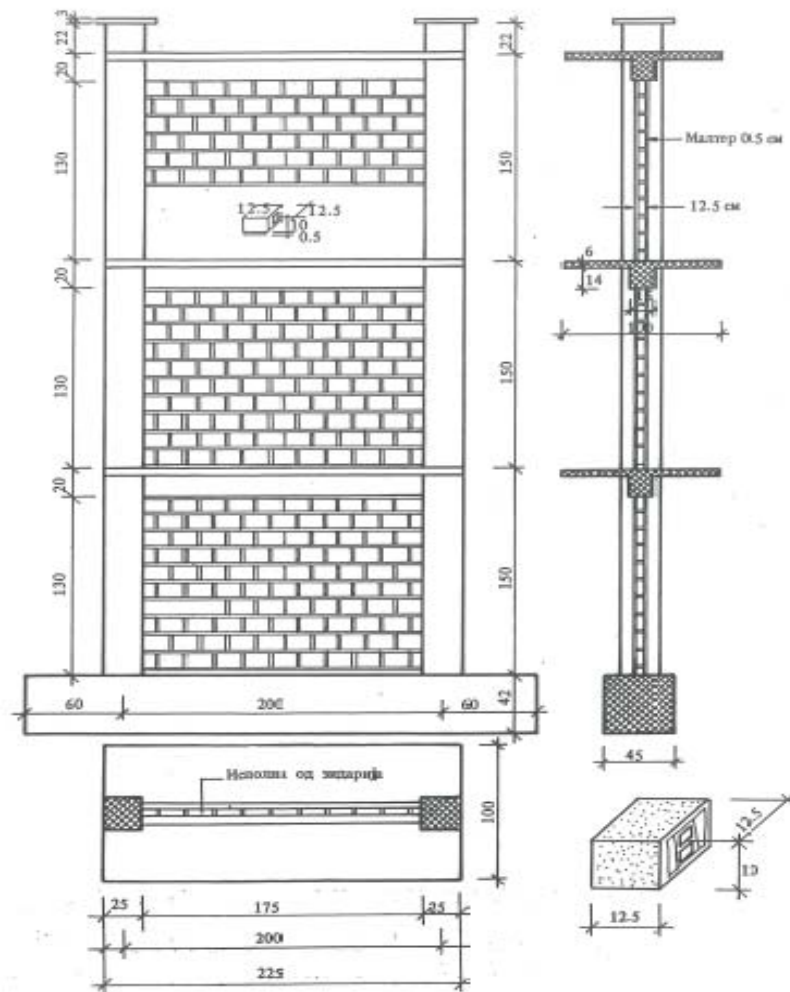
19 Model of a single bay three-storey reinforced concrete frame with masonry infill
